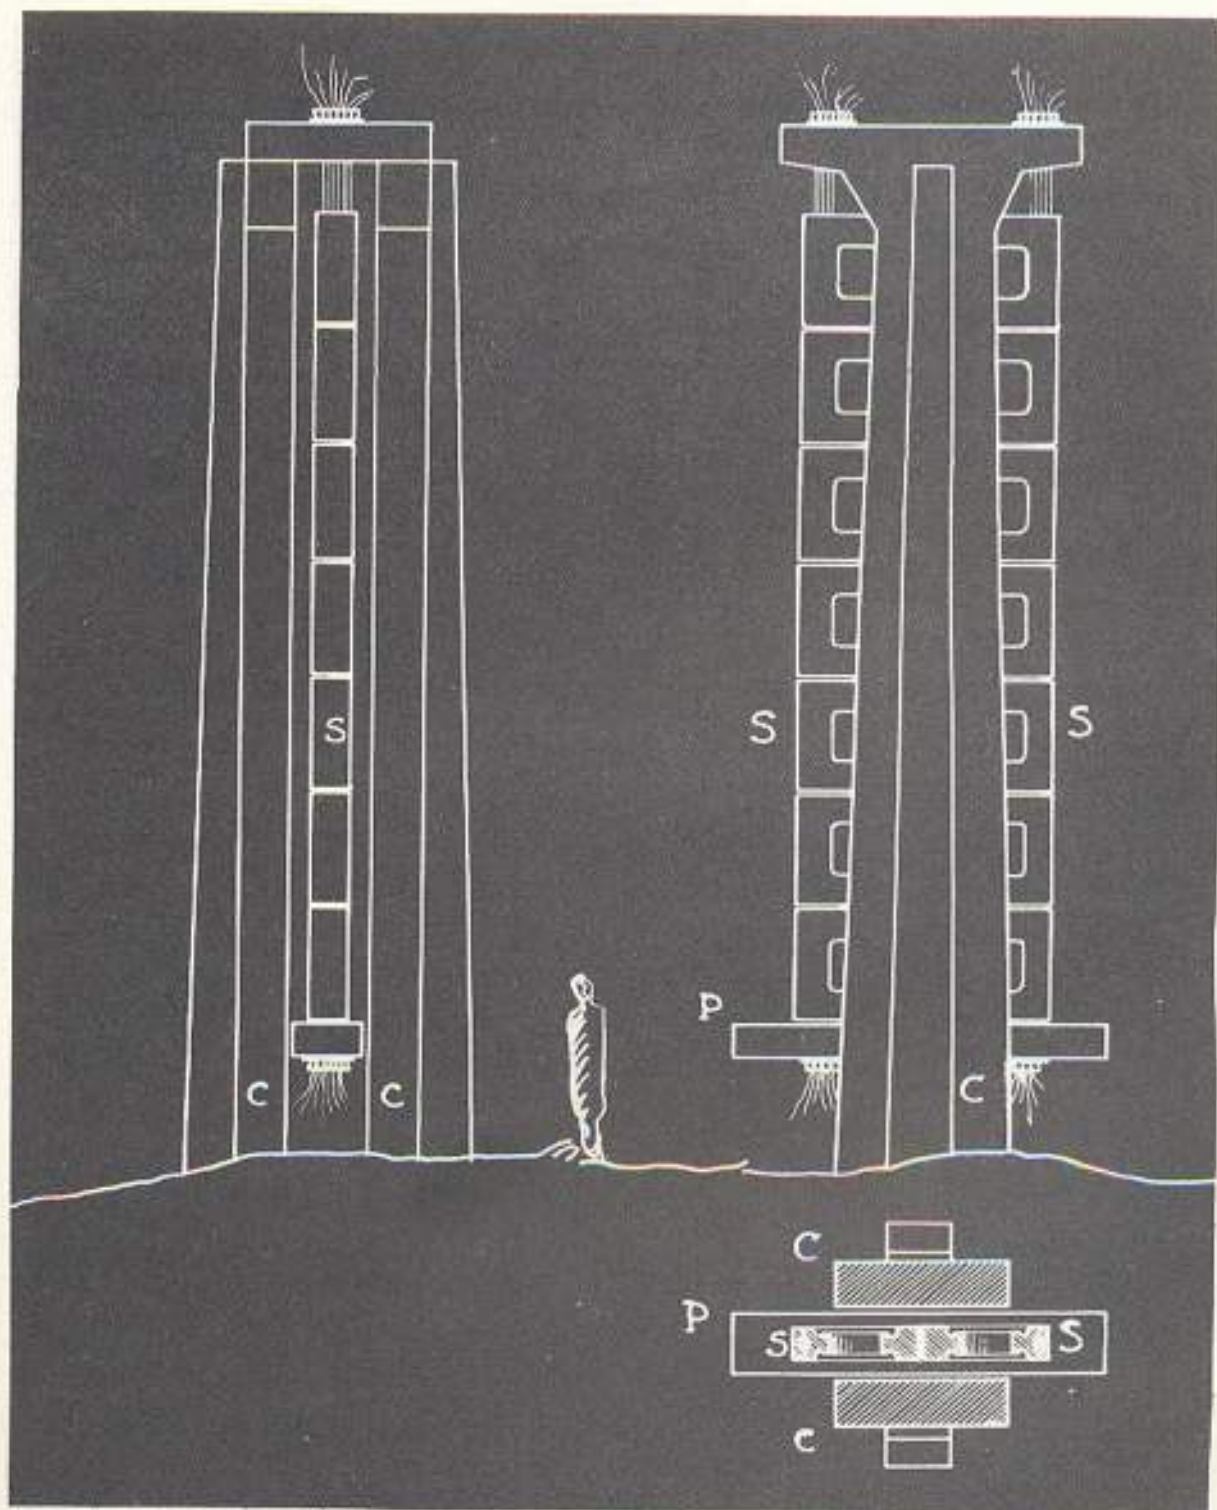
Method of prestressing girders, assembled from precast sections.
